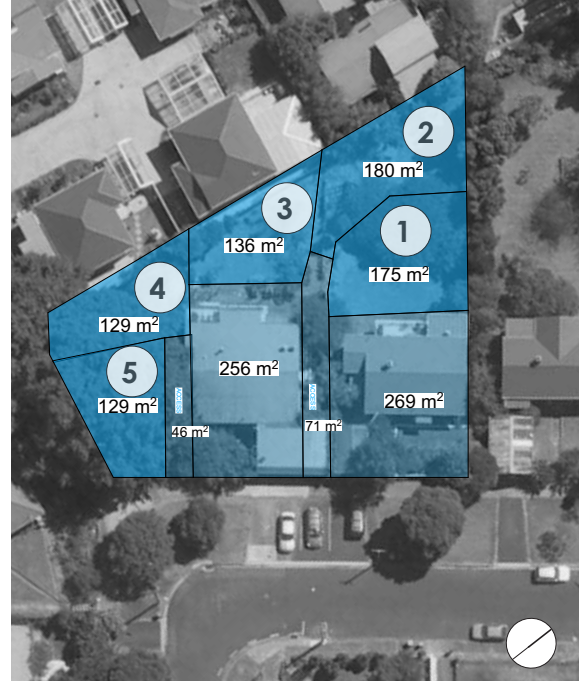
| Initial exploration site plan 19-21 Benfield Ave.
